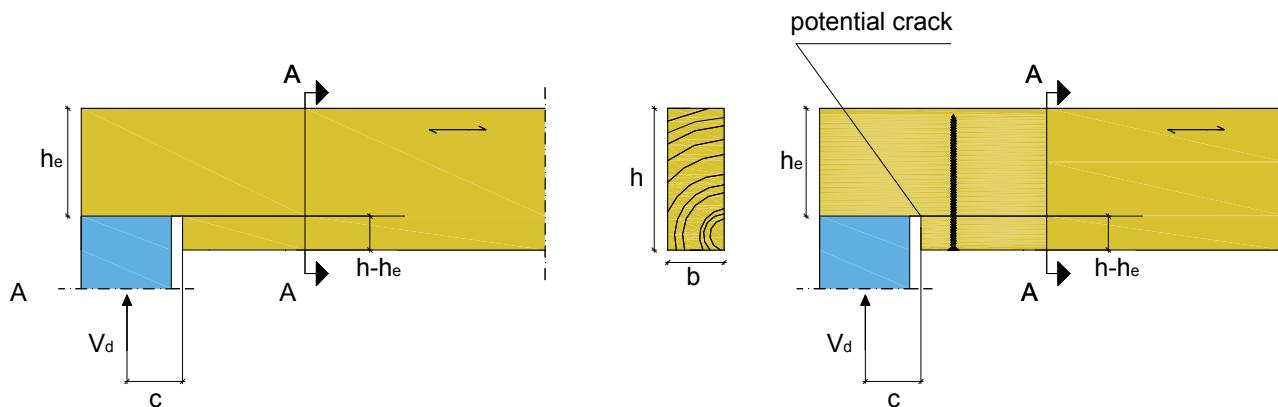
Example for tensile reinforcement of a notched beam support
